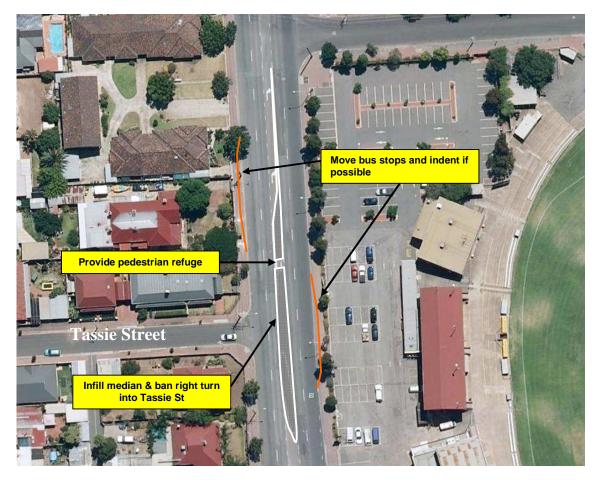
Proposed Brighton Road / Tassie Street Improvements
